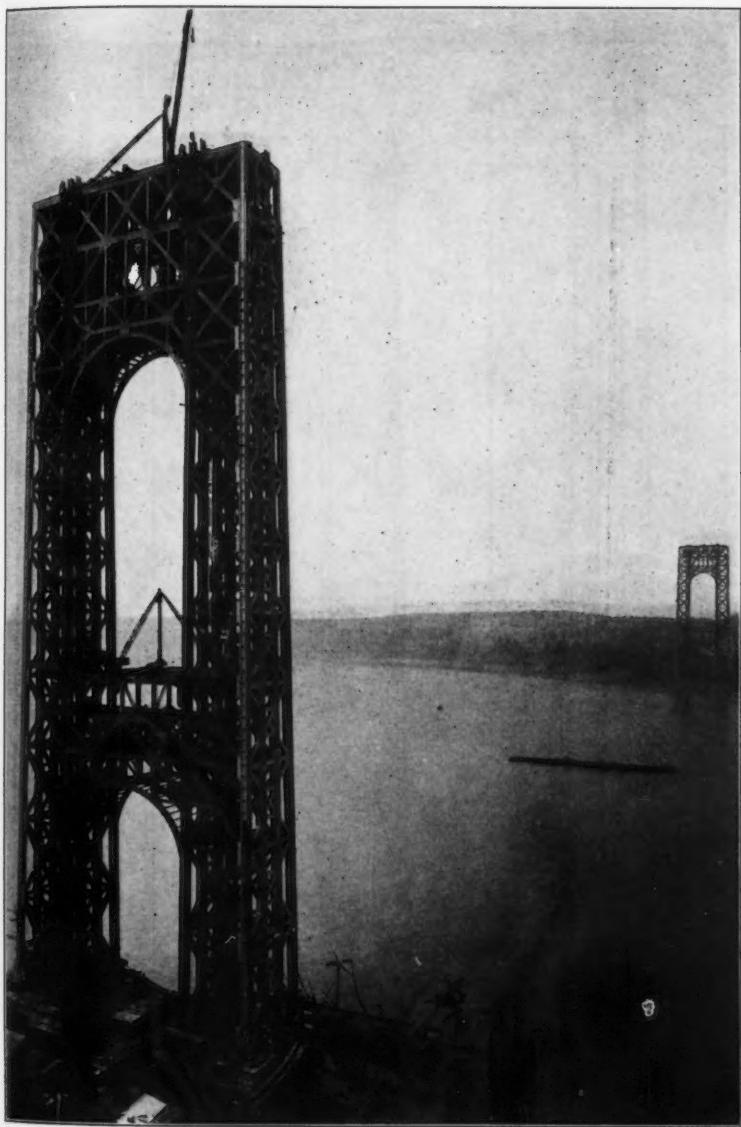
VIEW OF NEW JERSEY TOWER DURING CONSTRUCTION.
